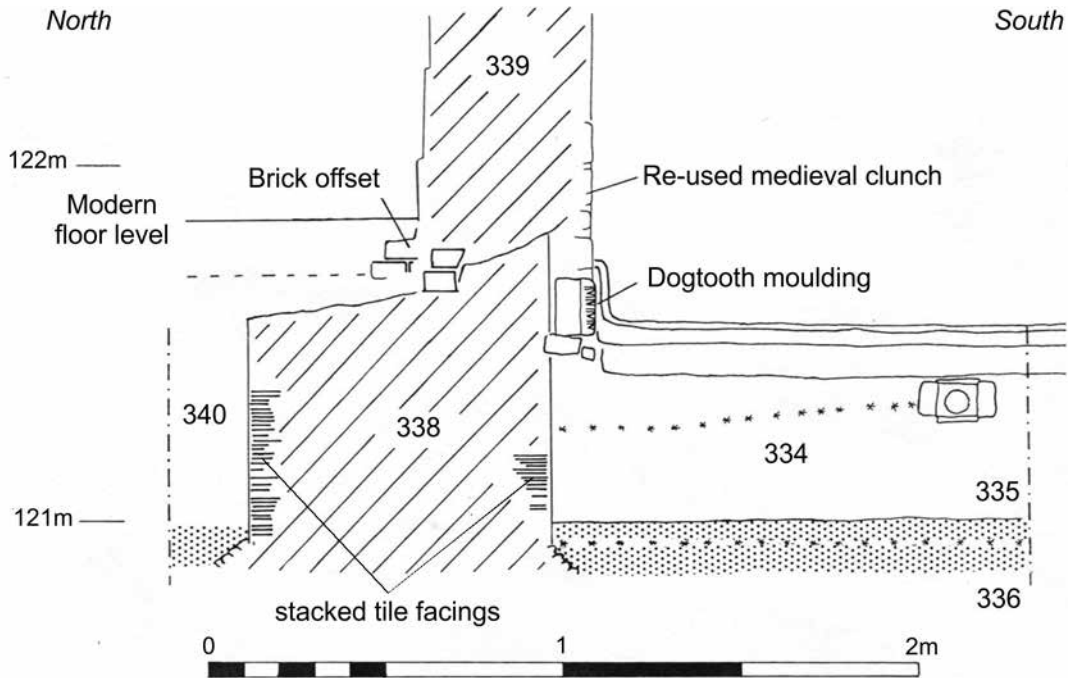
Area 9. The domestic east range and church were separated by late medieval broad wall (338)
